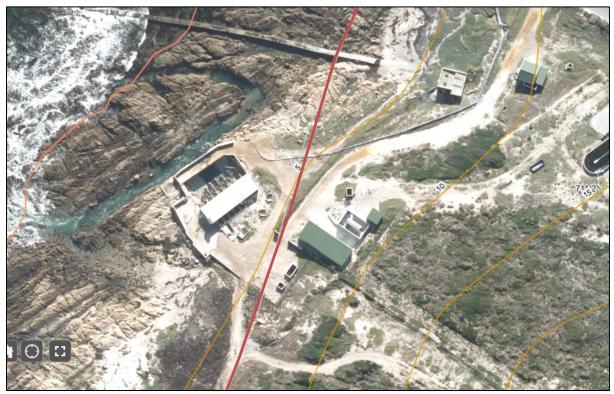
Aerial photo showing existing sump and pumphouse. Farm boundary indicated in red. Note that the bulk of the farm infrastructure is located on elevated contours above mean sea level.
